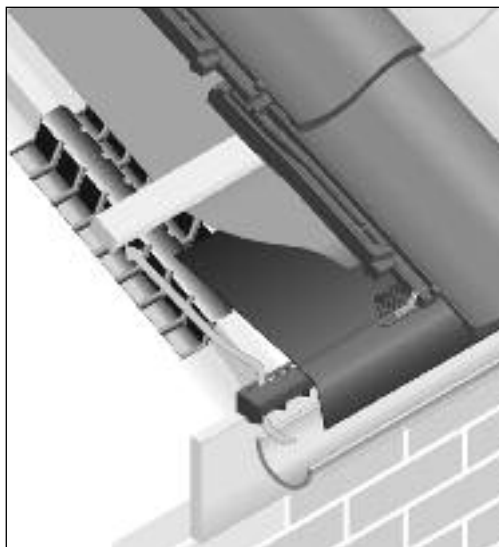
Typical eaves detail with over fascia vent strip, underlay support tray, comb filler and eaves clip
